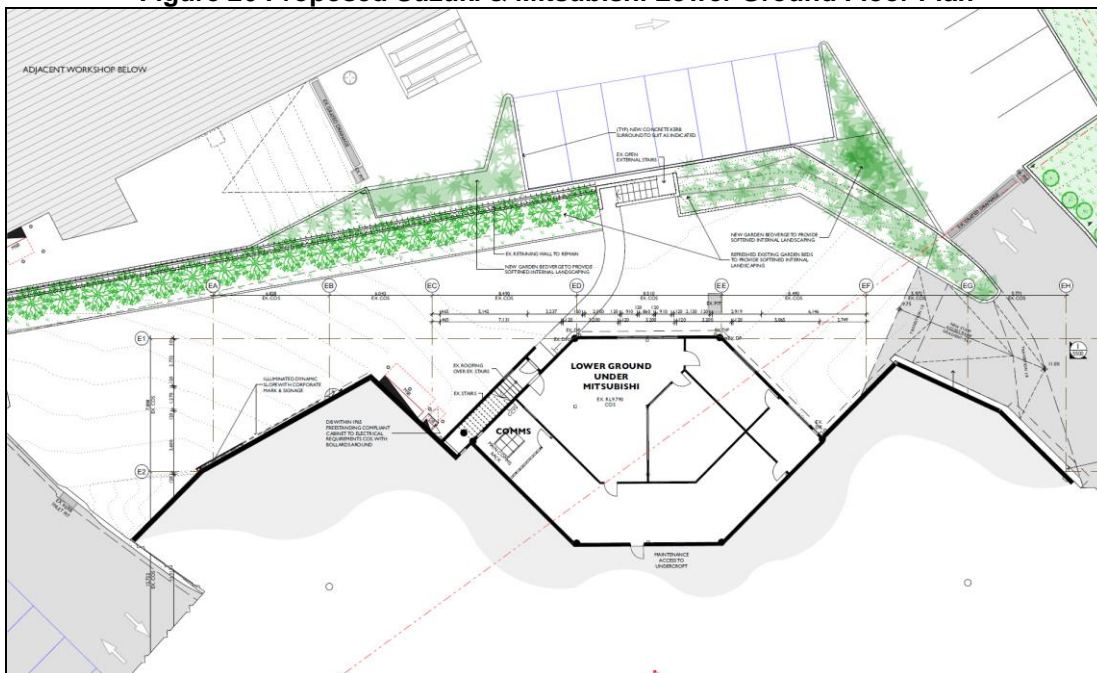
Proposed Suzuki & Mitsubishi Lower Ground Floor Plan
